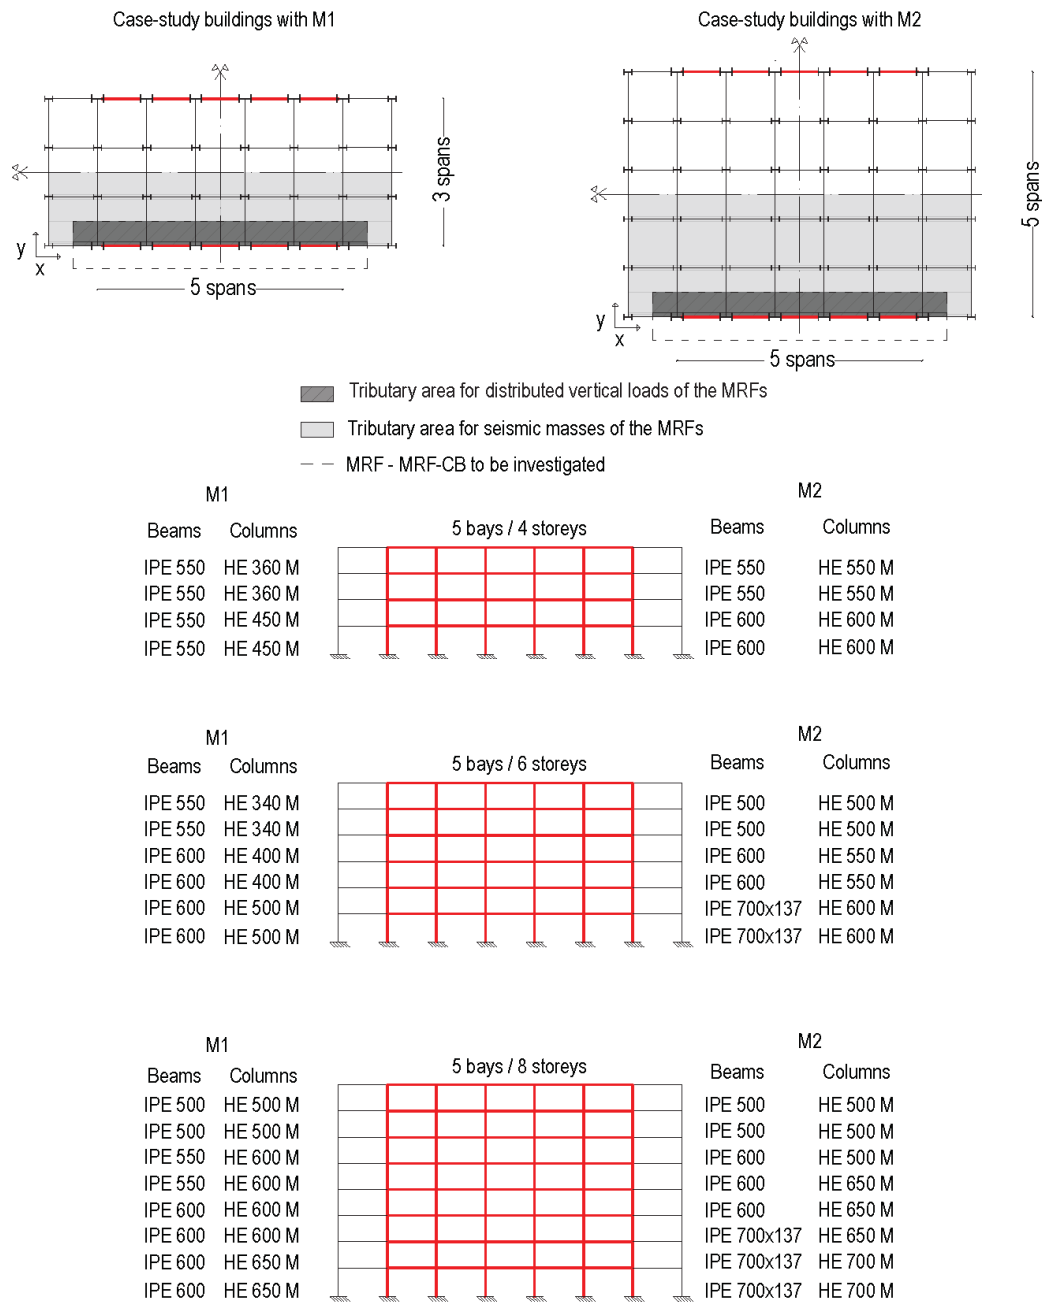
Case-study buildings: (a) Plan views; (b) Elevation views.
